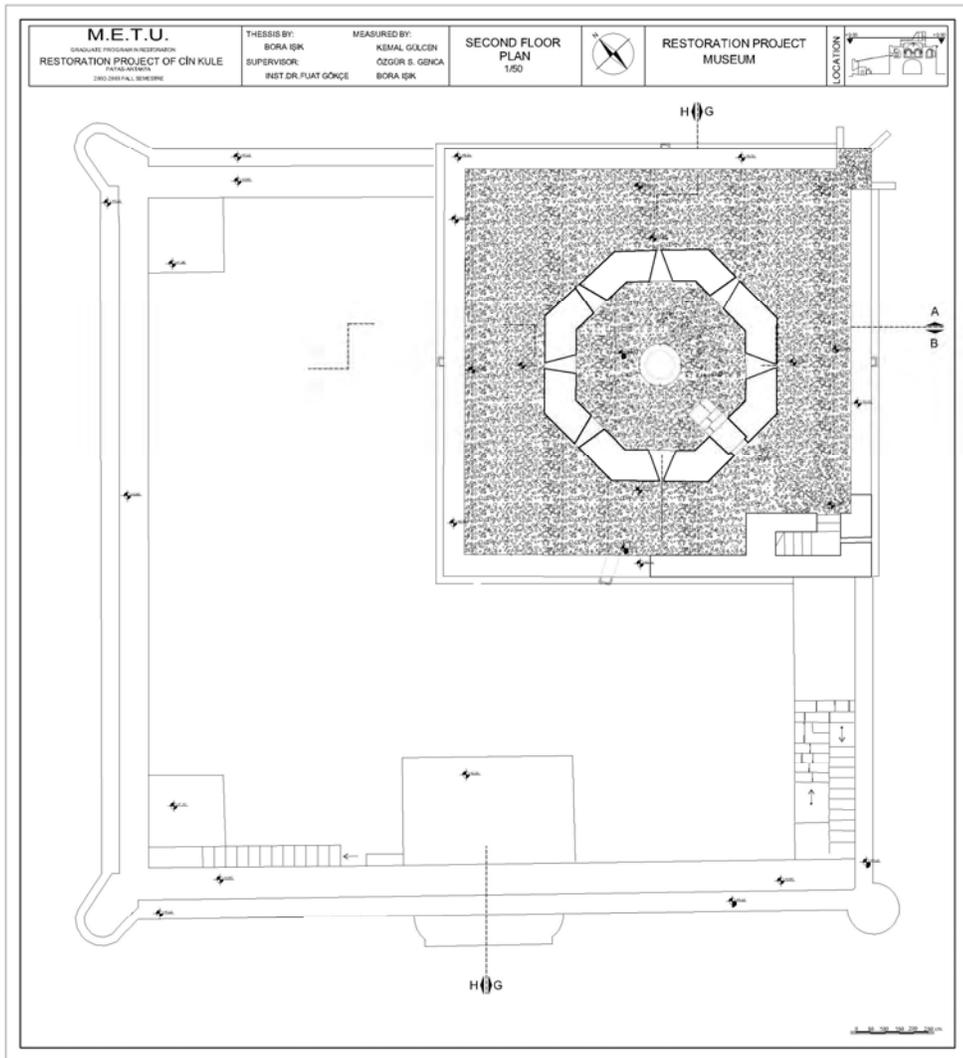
Restoration Project- 2<sup>nd</sup> Floor Plan.
